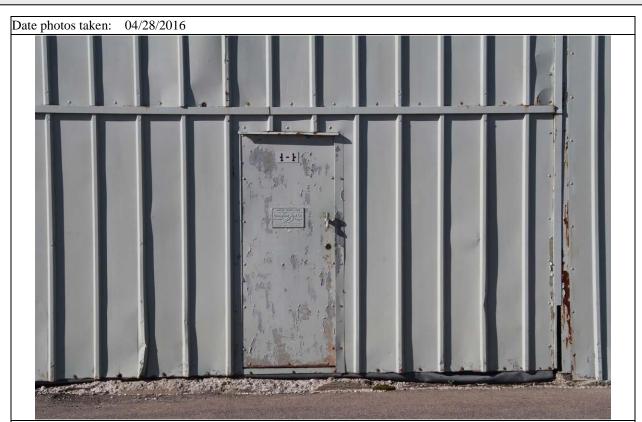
Detail of pedestrian door set into overhead bi-fold hangar door. Manufacturer's plate on door reads "Morgan Canopy Door, Pat. Applied For. Mfg. by International Steel Co., Evansville, Indiana, U.S.A. Fabricated Steel Building Products, Bowstring Trusses – Revolving Doors."
